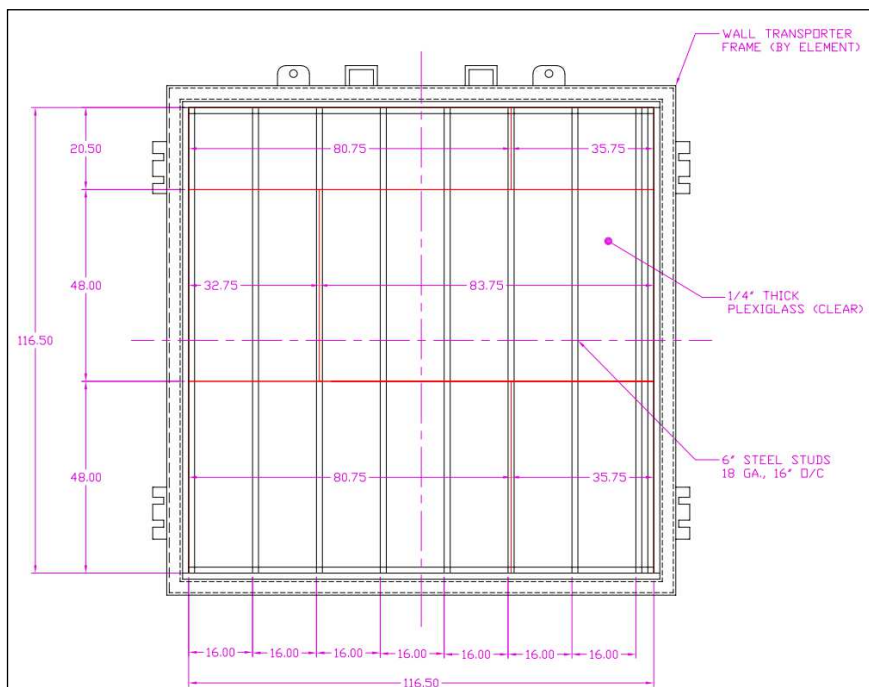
Back-up Test Wall Framing Construction (dimensions in inches)
